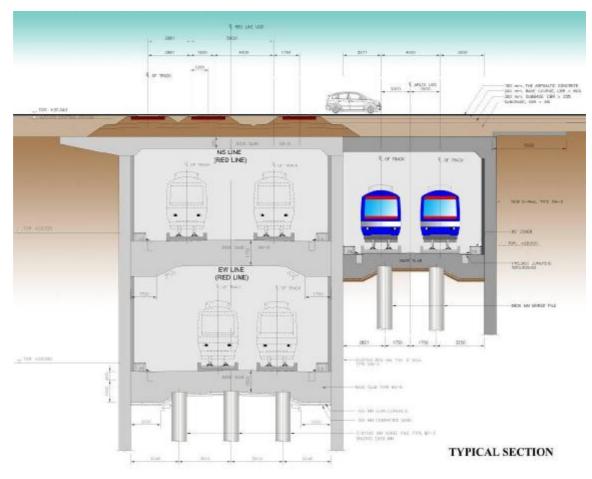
Typical Section of Underground Structure in front of Chitlada Palace
